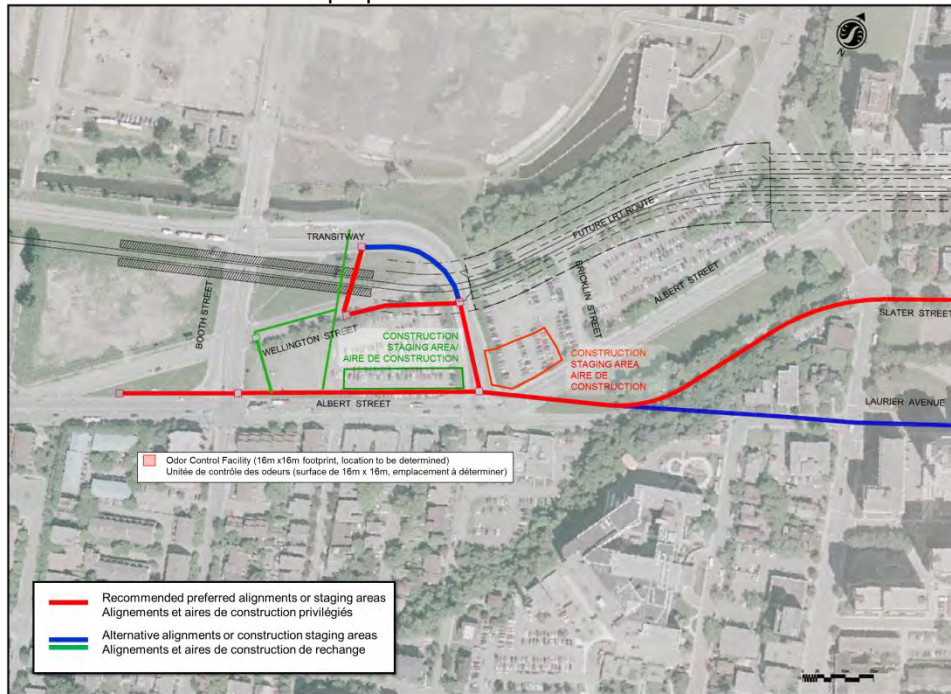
Site 1 LeBreton Flats; Site plan of western end of the Project Area showing proposed staging areas.
